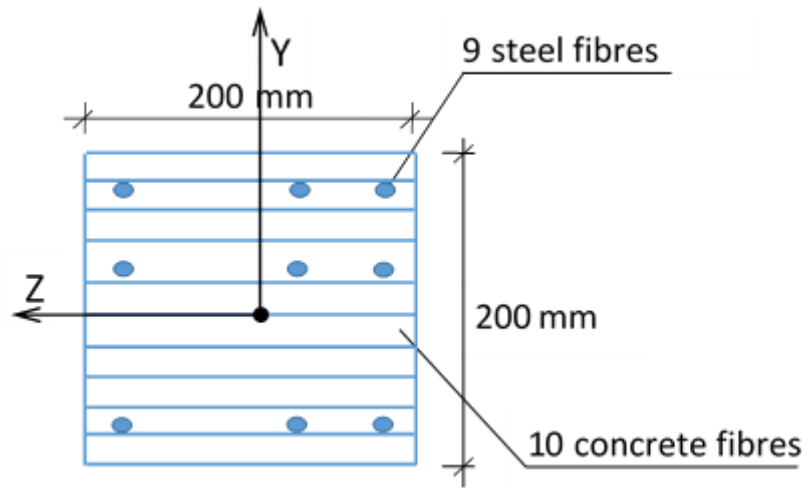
Fibre beam element cross section mesh for end sections of specimens C2-II-SF and C2-II
